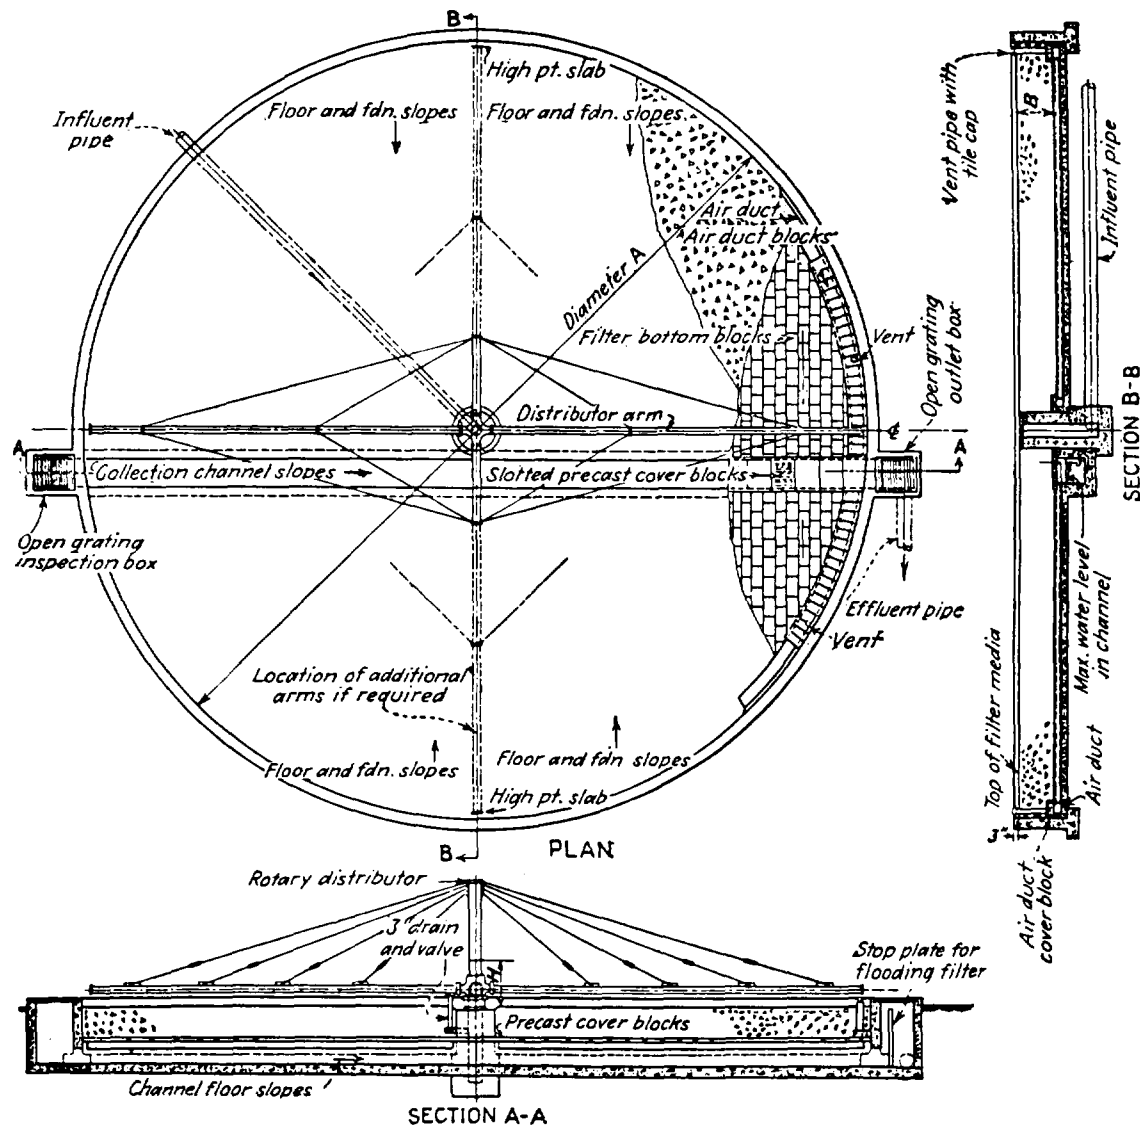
Plan and sections of a circular trickling filter. (Courtesy Link-Belt Company.)
